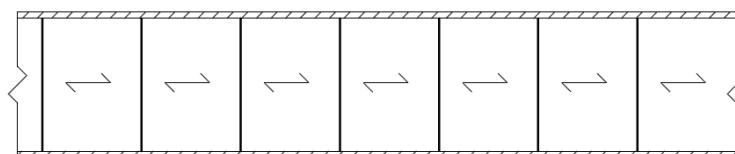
Roof Plan (LiveRoof Maxx Option 3)
